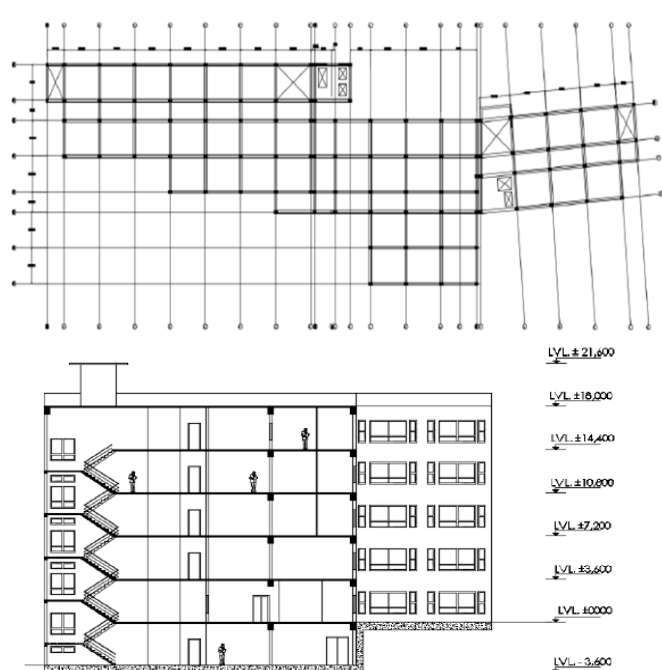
Structural Plan of Building with Beam-Column Layout Fig 4: Building Section Elevation
